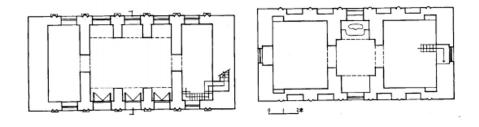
The Beamless Hall of Suzhou: the plan of the ground floor (left) and the plan of the second floor (right) (Guxi Pan)
